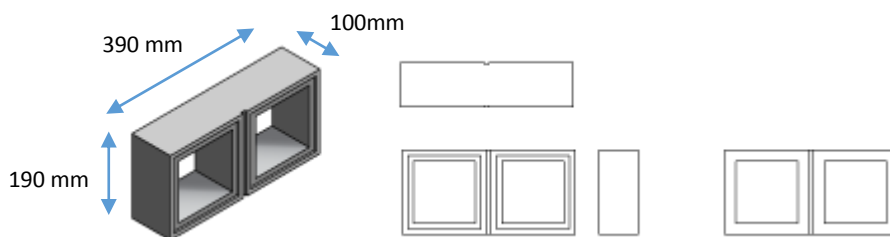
Type B concrete vent blocks at PJ Trace Centre
